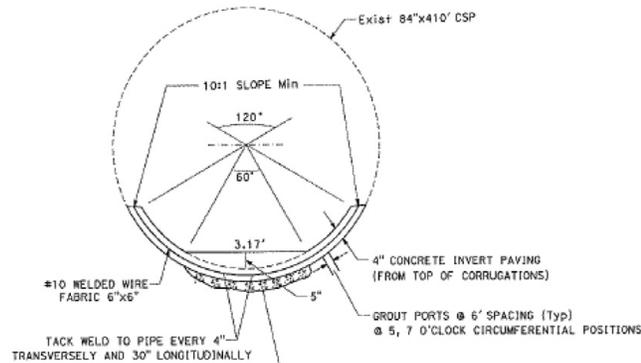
Standard detail for concrete invert paving (Caltrans 2013).
